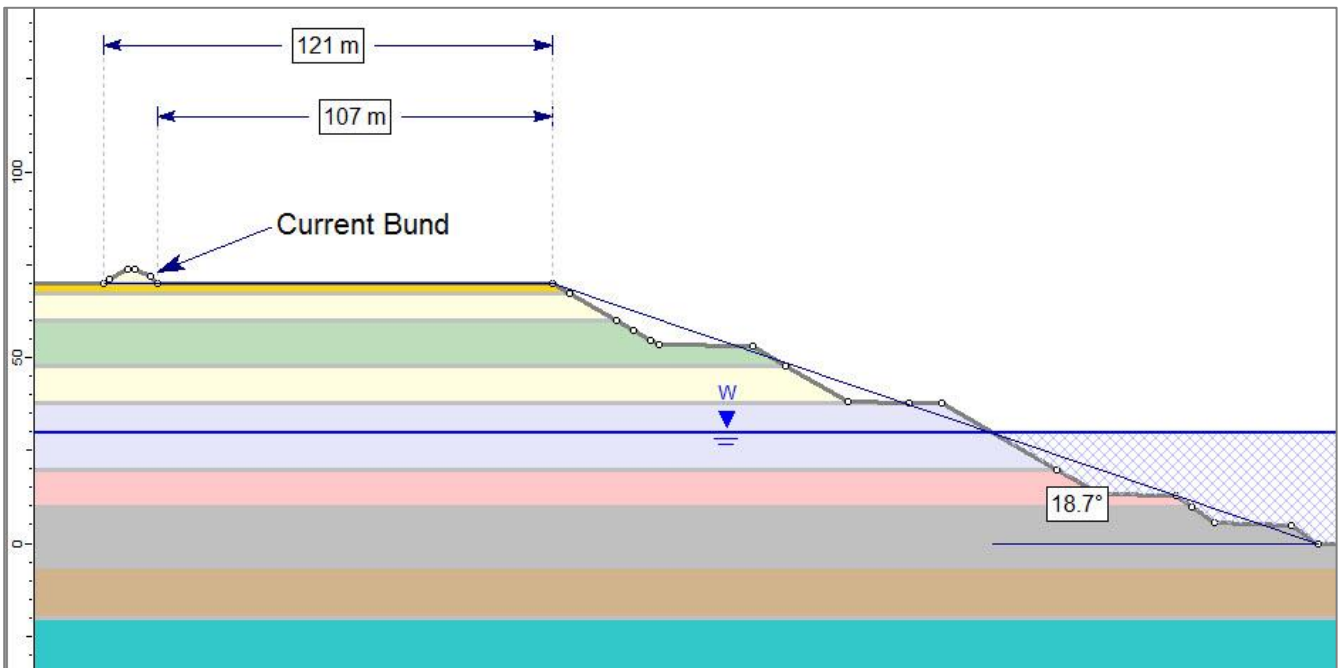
Section Geometry – West Wall Section for Abandonment Bund Assessment
